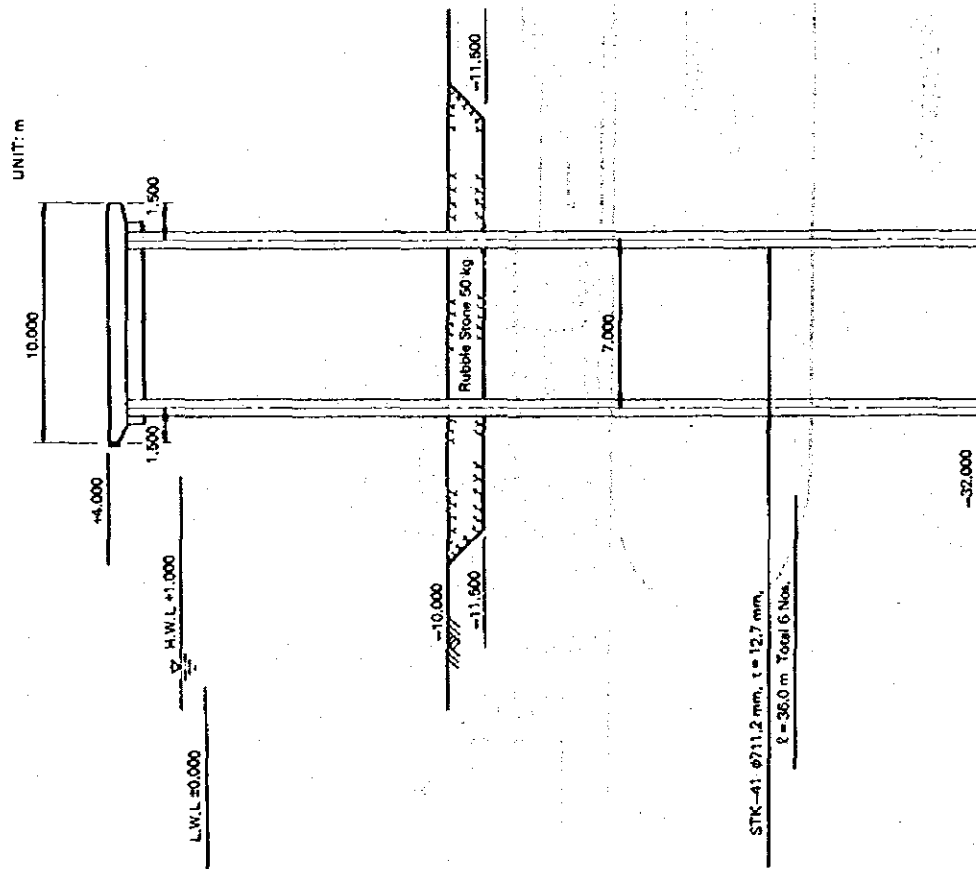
(c) Typical Section of Berthing Dolphin
